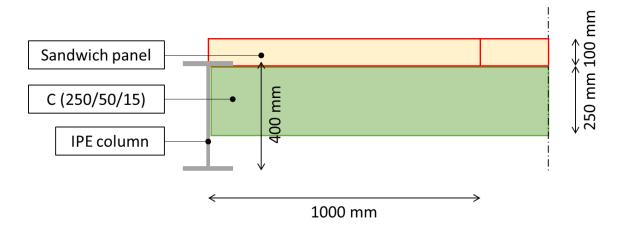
Horizontal section traditional façade system (width of one sandwich panel is 1000 mm)
